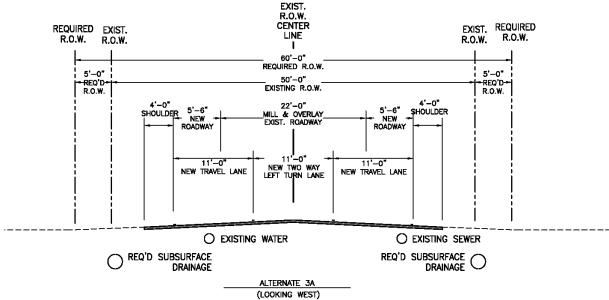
Proposed Typical Roadway Section for Two Way Left Turn Lane at 60' ROW along Minnesota Park Road (Source: RCLC)
